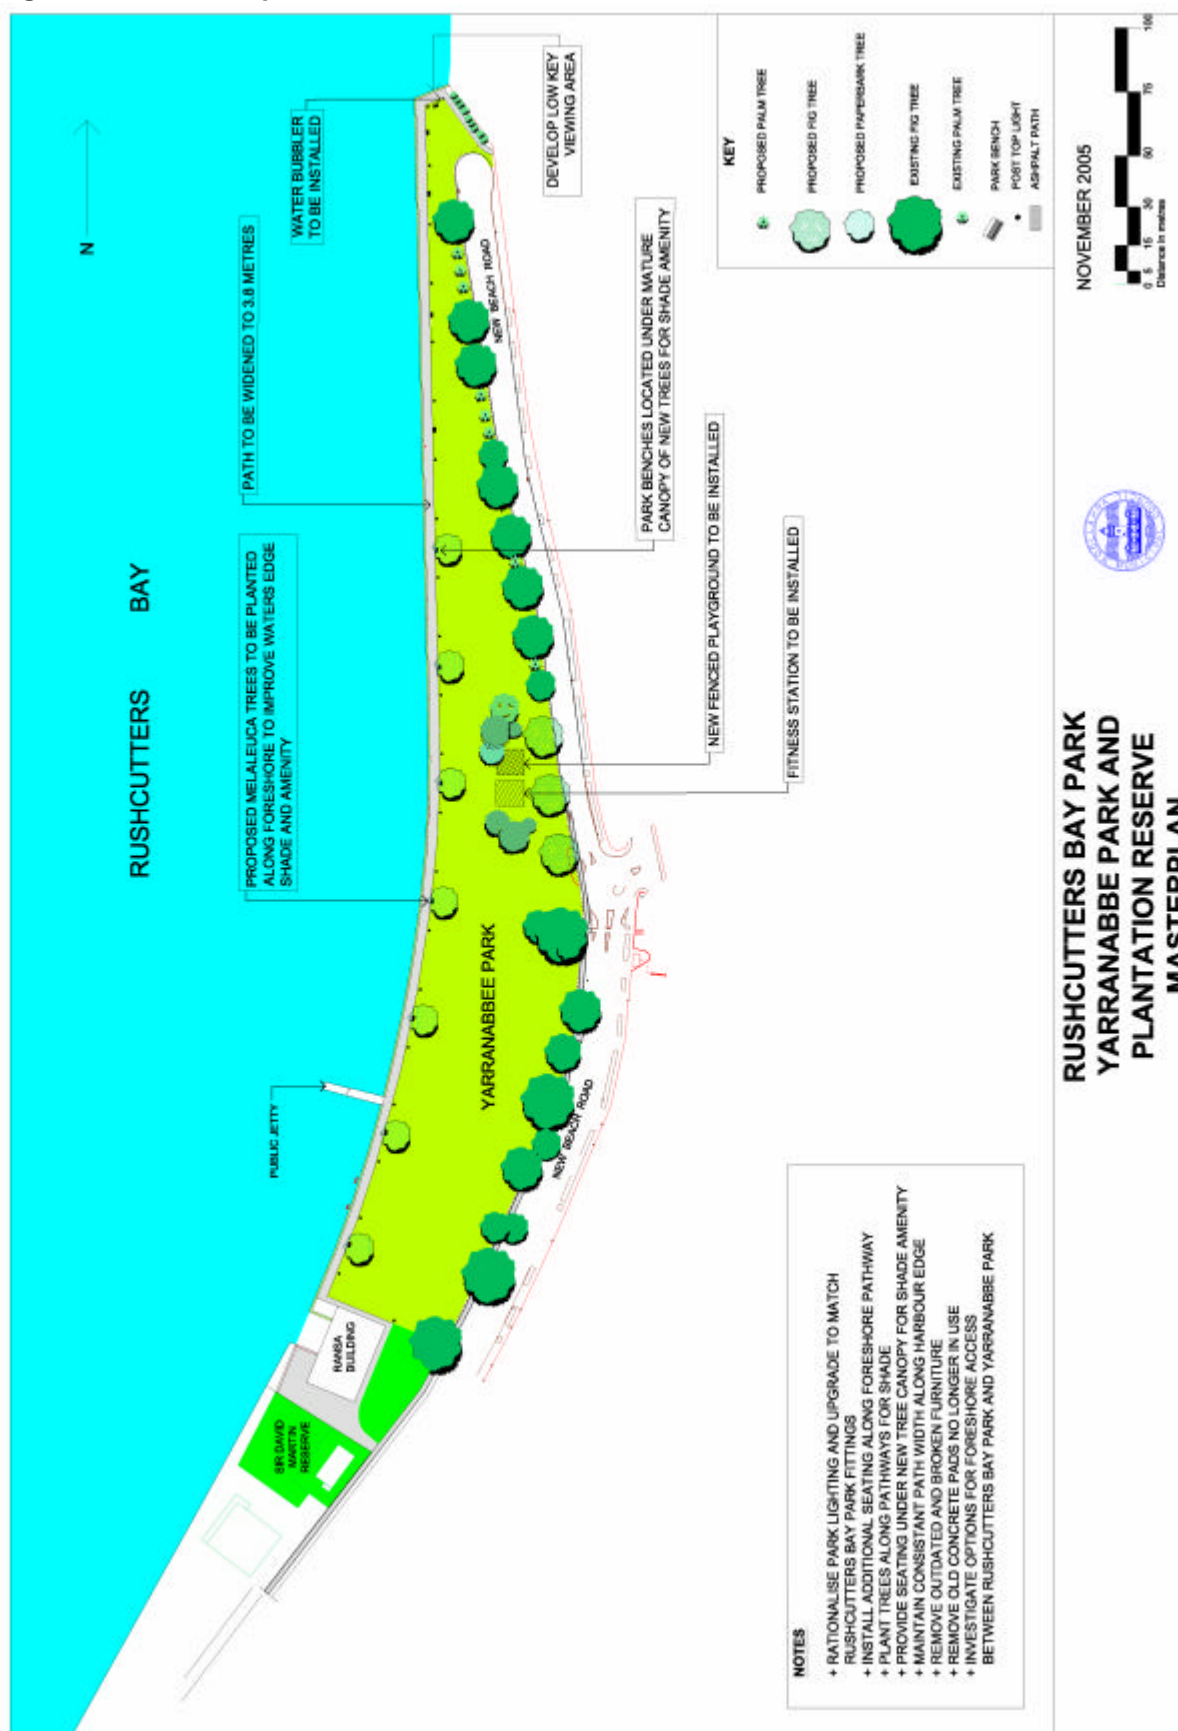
Proposed tree plantings in Rushcutters Bay Park
